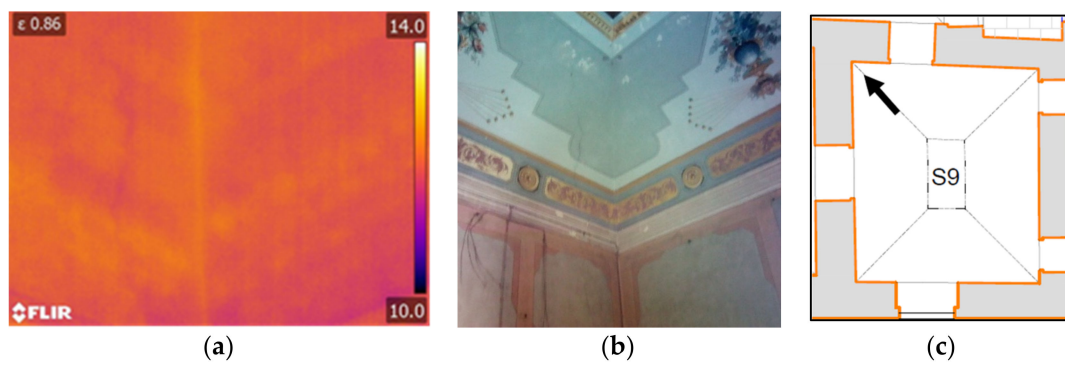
Room S9: (a) infrared image, (b) photography view and (c) plan view.
